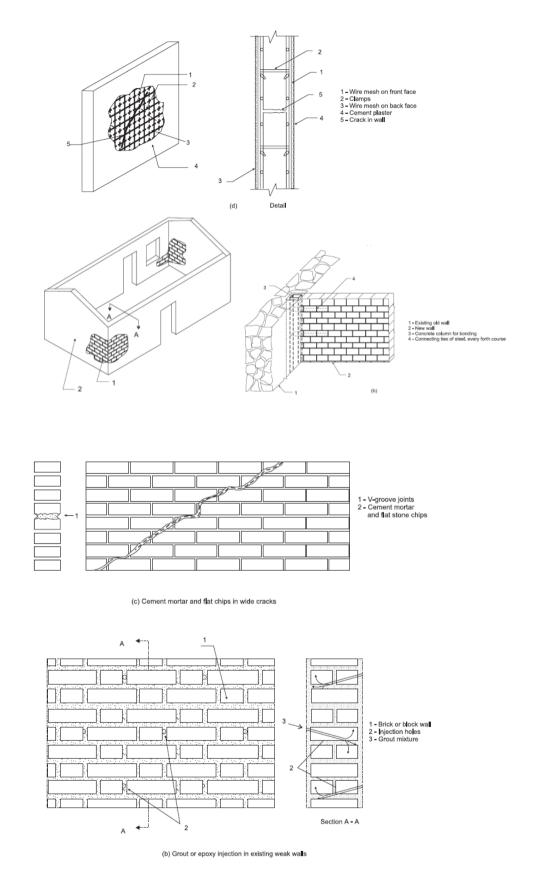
Methods: Stitching, Grouting, Re-bar Replacement, Re-construction,
